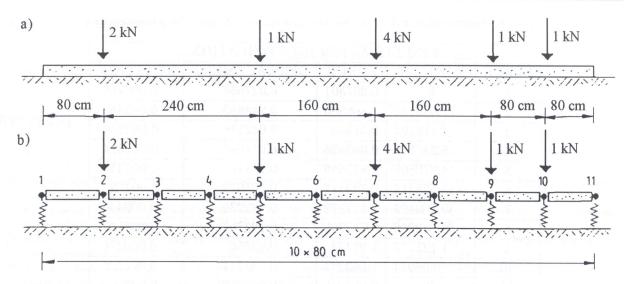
a) Beam on foundation, b) model of the beam and foundation
